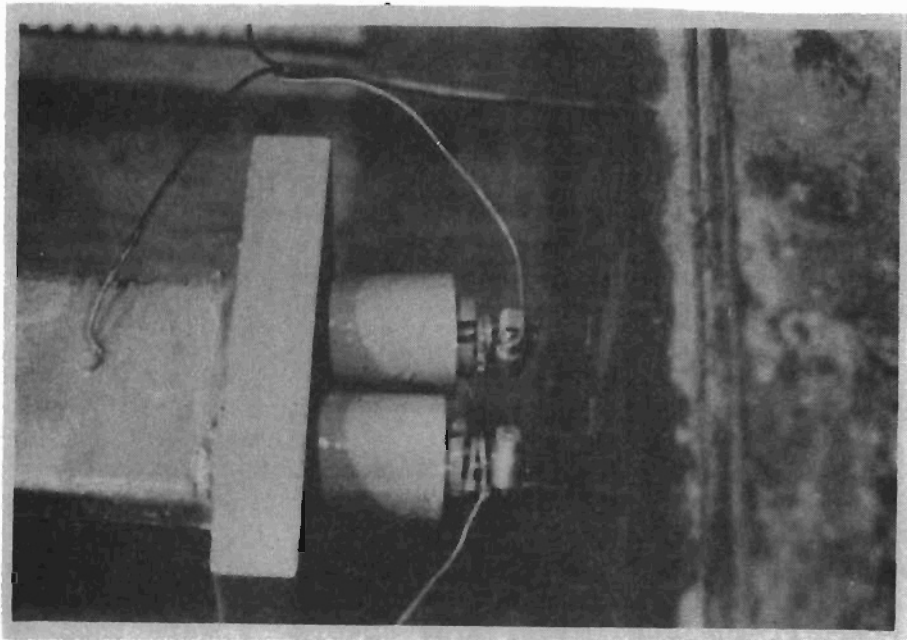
Electrical connections to prestressing strand and galvanized duct
